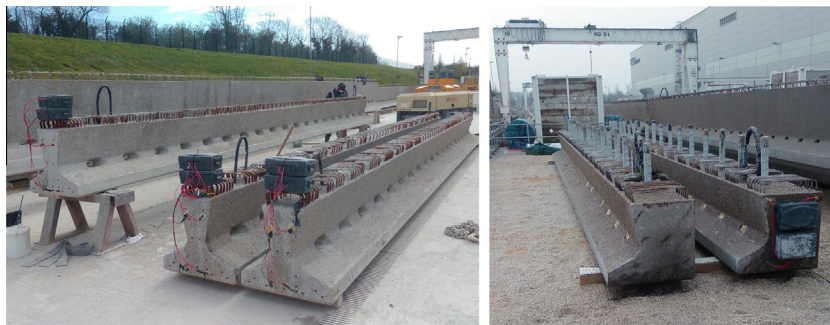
Completed TY7 beams (left) and TYE7 beams (right). Note the sensor cable ends and connectors stored within temporary enclosures.
